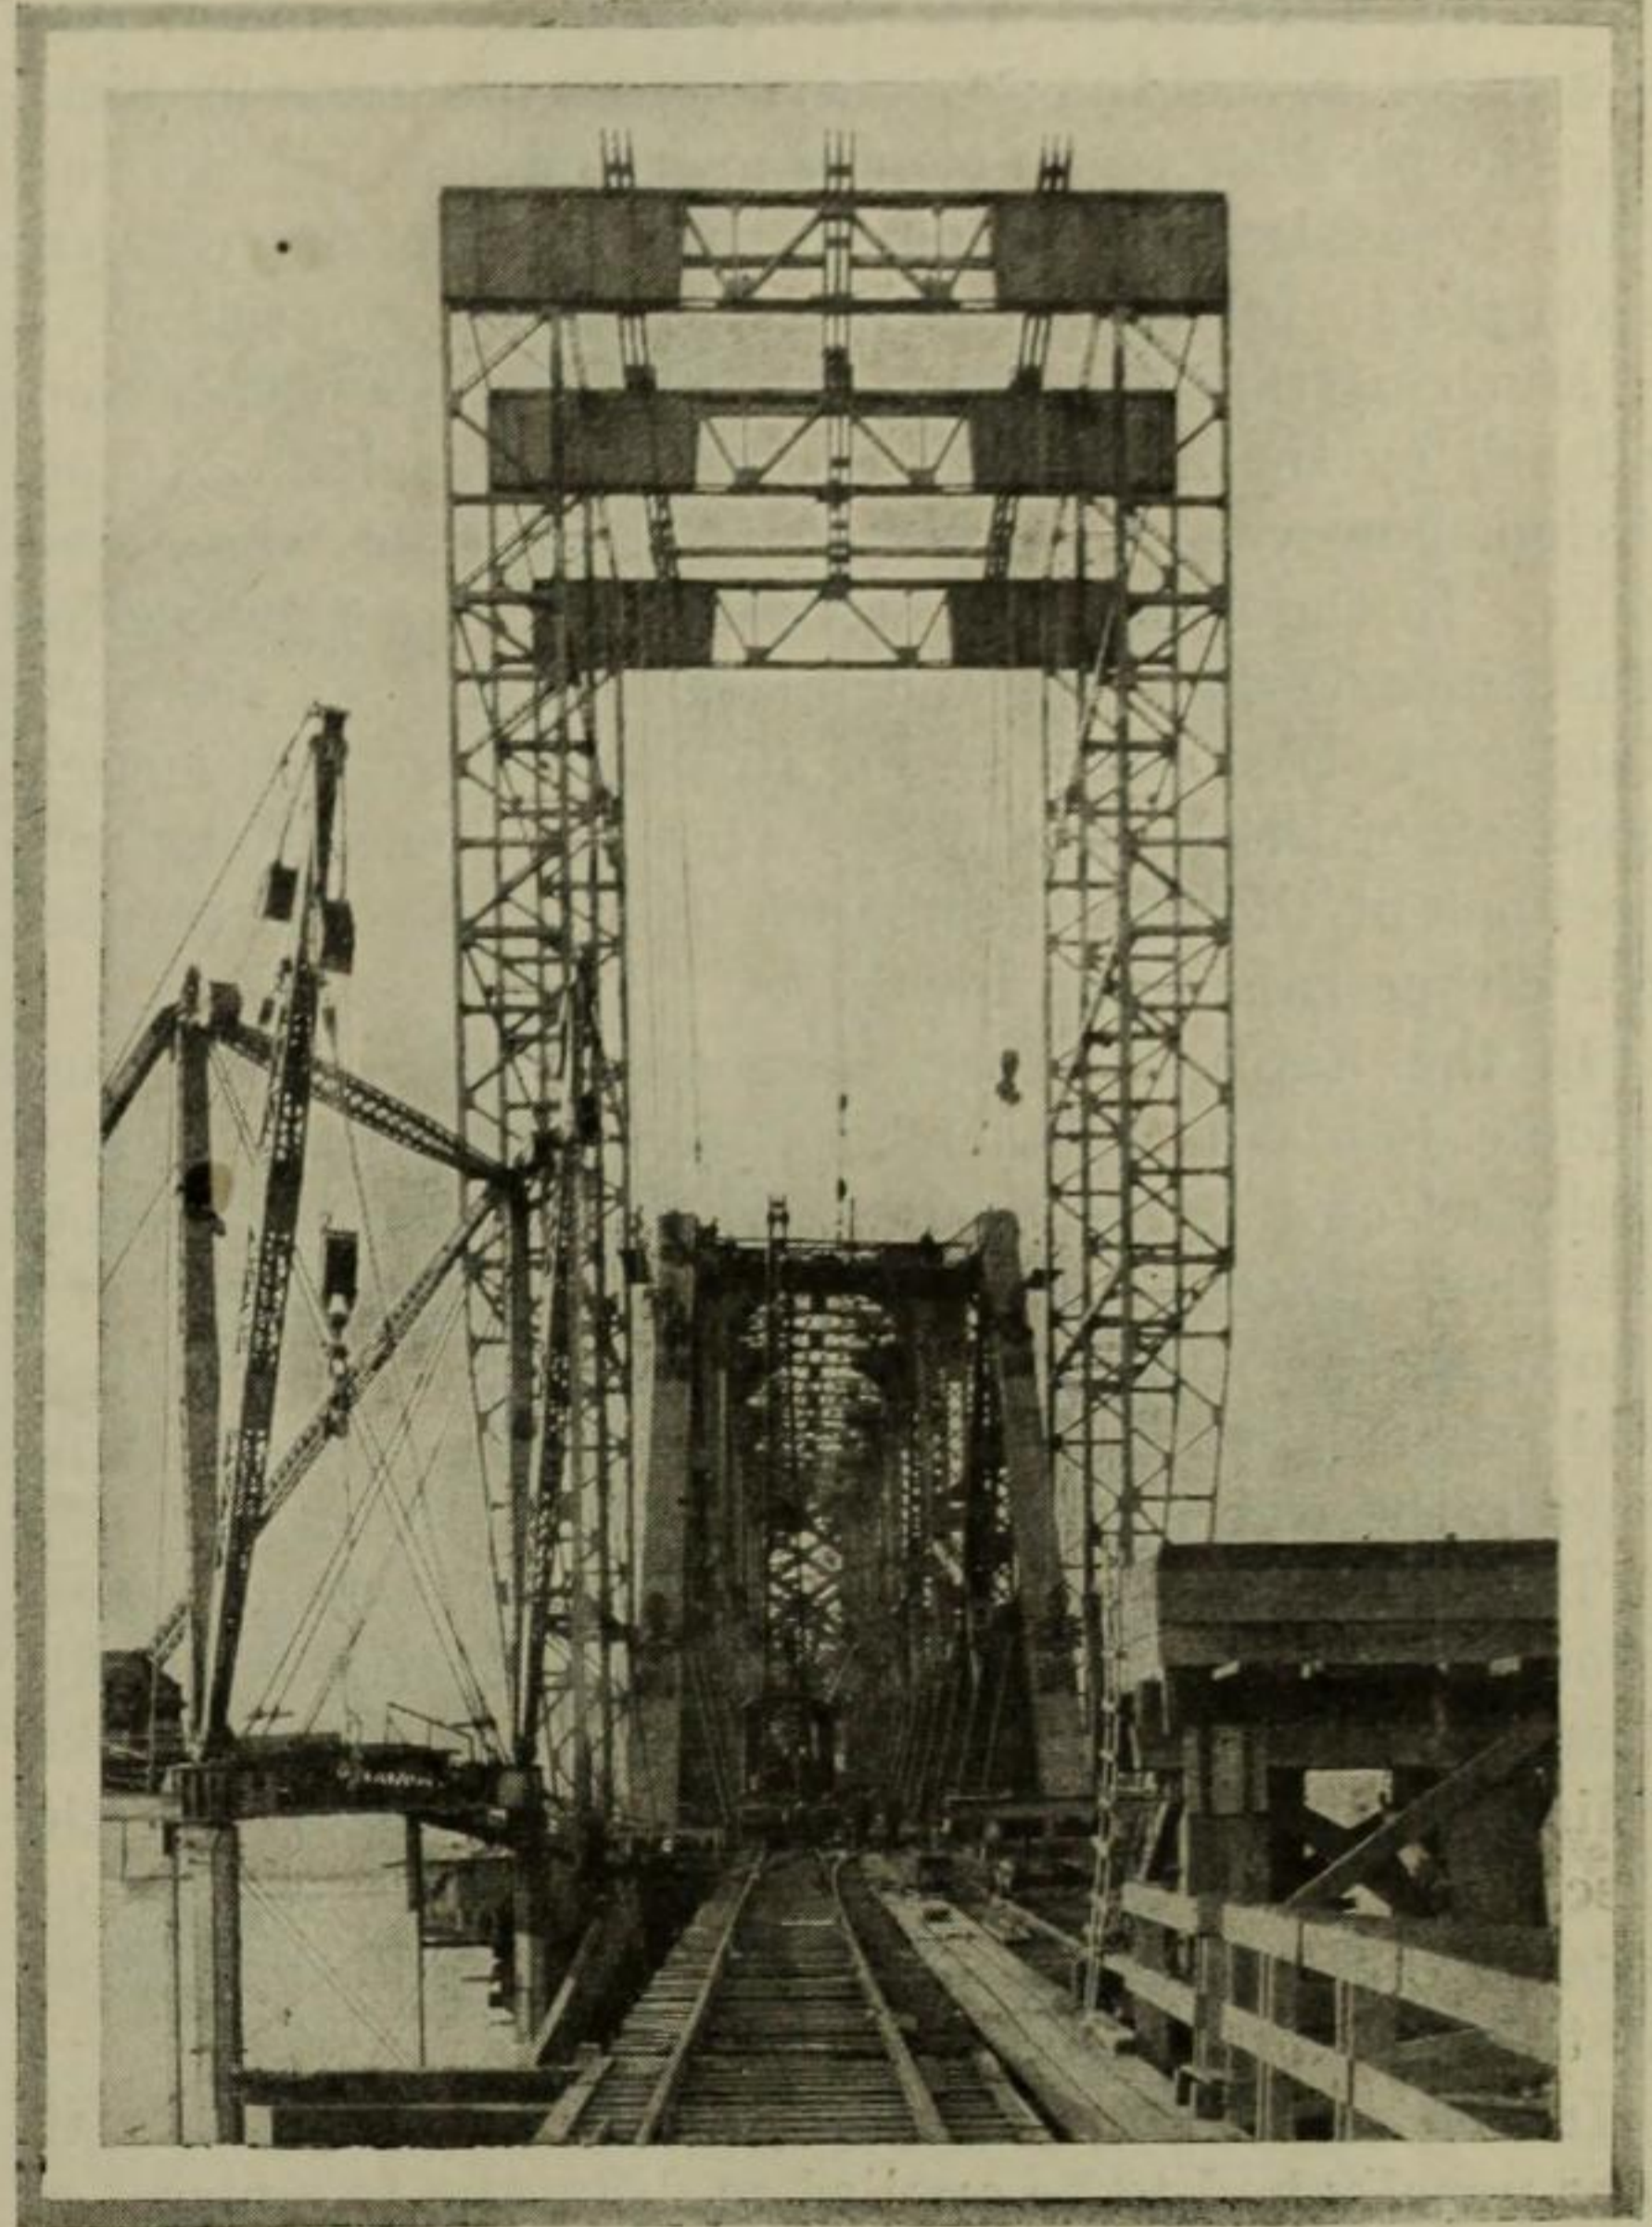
FULL-HEIGHT GANTRY AS USED FOR OHIO SPAN TRUSS ERECTION
